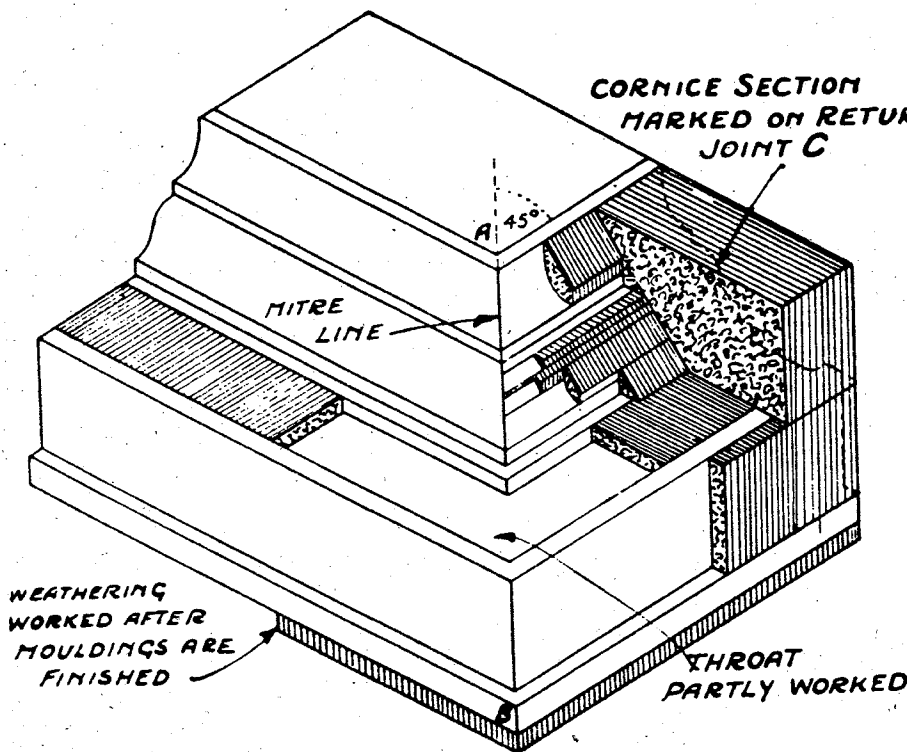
WORKING RETURN PIECE OF CORNICE.
